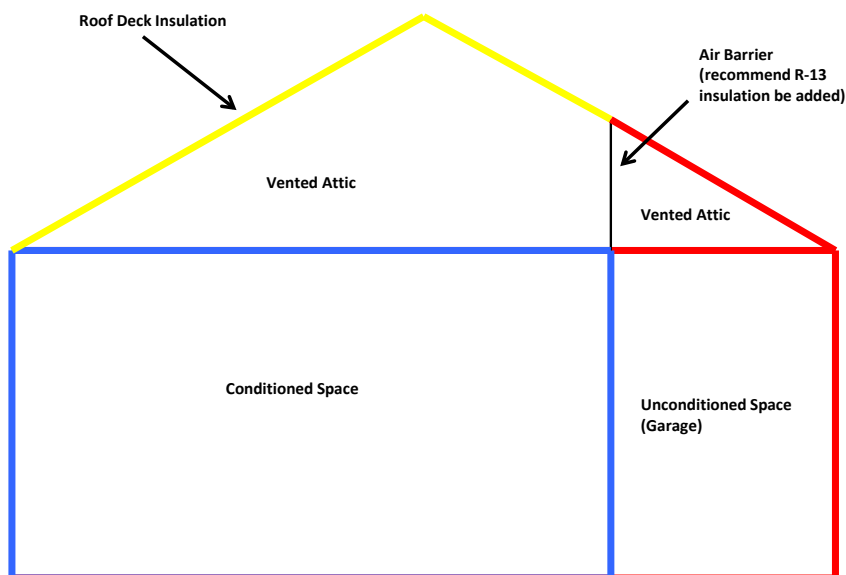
House with attic insulation extending over conditioned space, attic over conditioned and unconditioned space separated by an air barrier
